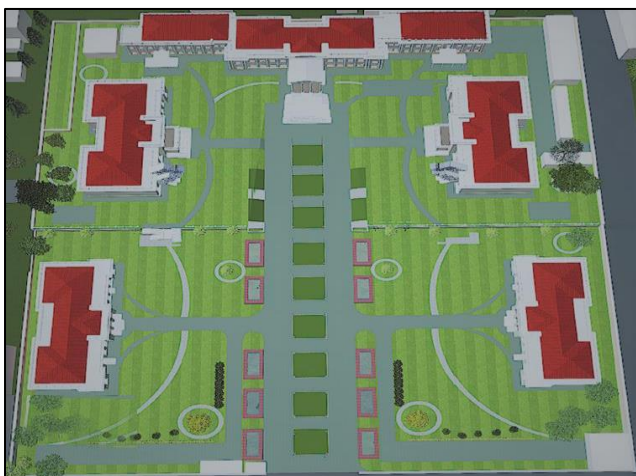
Site Plan of the Extension Proposal by Aba Nkasse et al. (2025).
